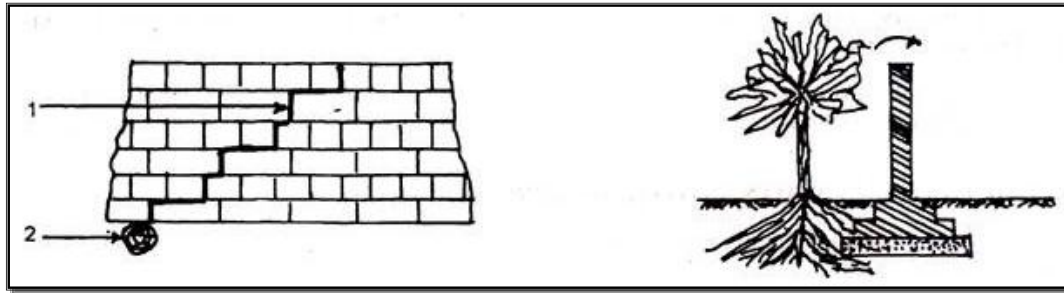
Cracking of compound wall due to growing roots under the foundation.
